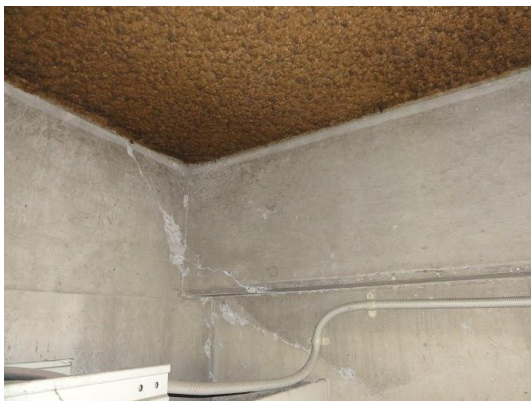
Close up view of the beam column joint at the NE corner from outside.
